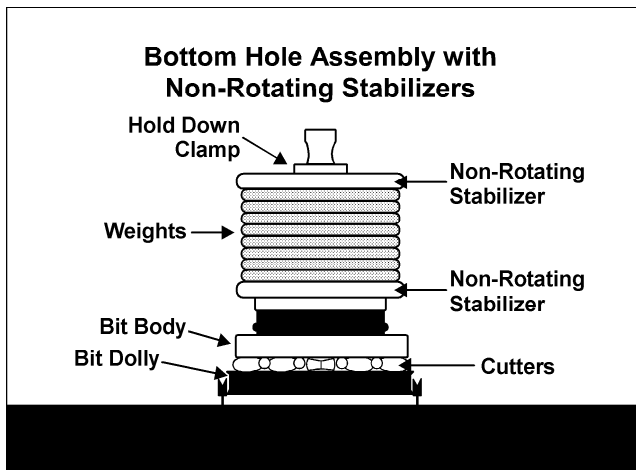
14-ft (4.3-m) diameter bottom-hole assembly.
